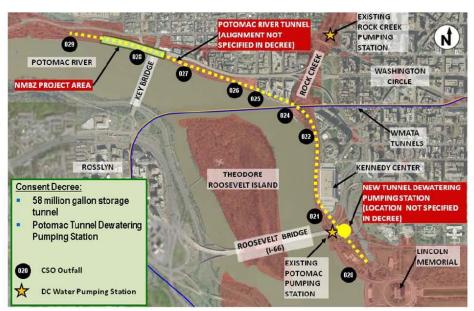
Conceptual Potomac River Tunnel Schematic (Per Existing Consent Decree)
